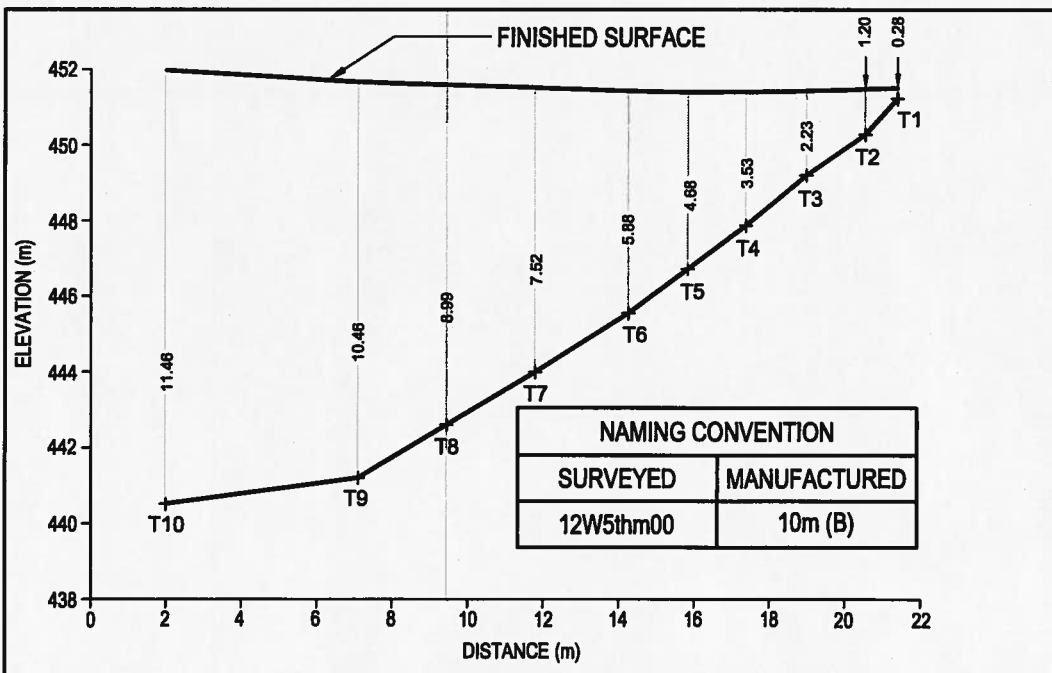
12W5thm00 (10m (B)) - AS MANUFACTURED, PLAN, AND SECTION
